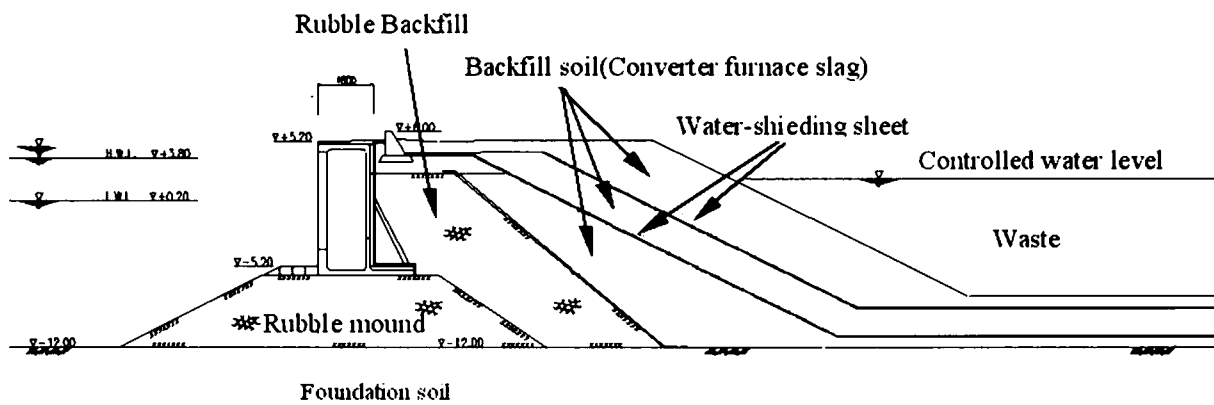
Cross section of controlled disposal site (Kotake et al., 2004c)
